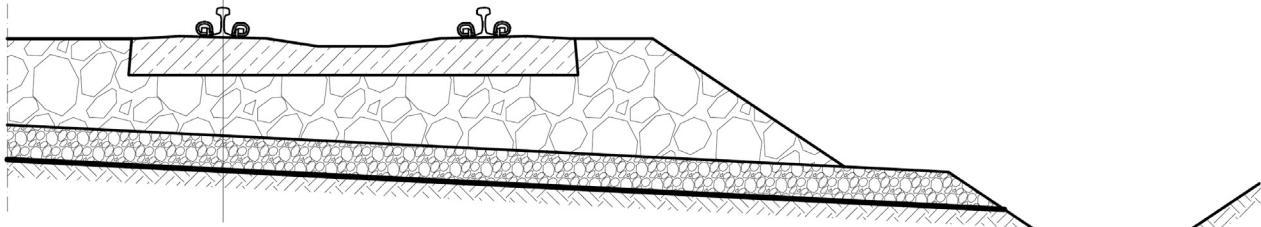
Cross-section of the track structure and the subgrade strengthened with a single protective layer (own study based on [9])
